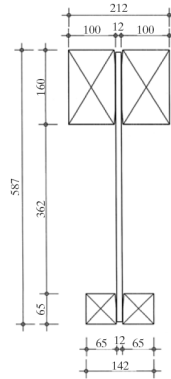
Section of the glass-wood beams applied at the Hotel Palafitte.³¹ A thermally tempered 12 mm single sheet of glass was used.
